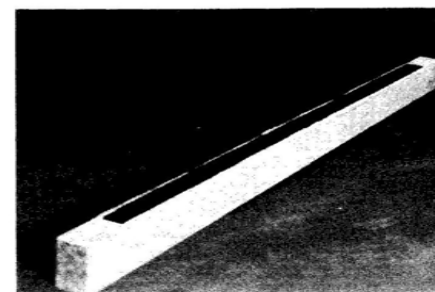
Photograph of FRP-Reinforced Wood Beam
